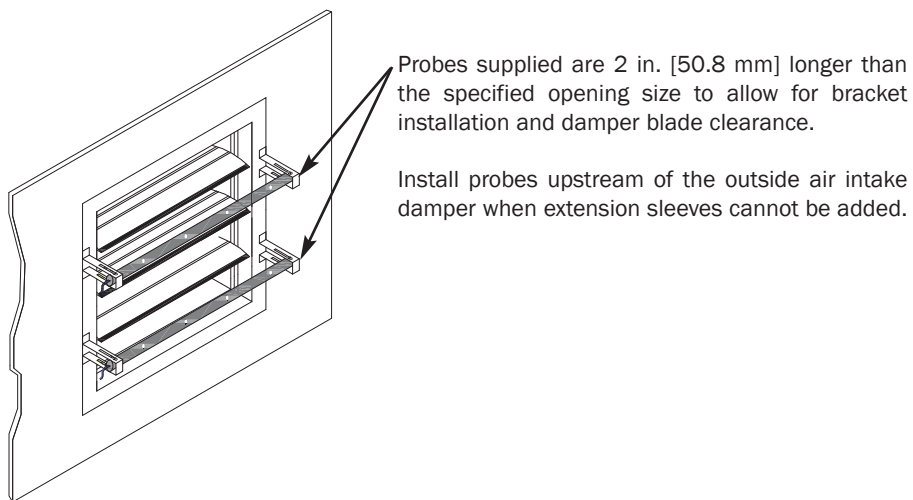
HP1/SP1 Standoff Mount Upstream Outside Air Intake Damper Detail
